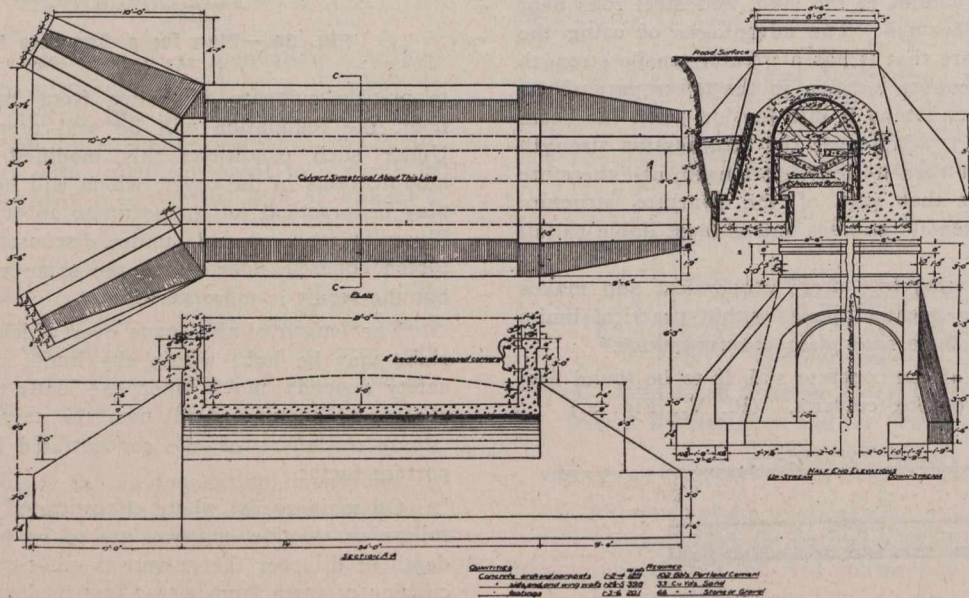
Plan for Plain Concrete Arch Culvert.
